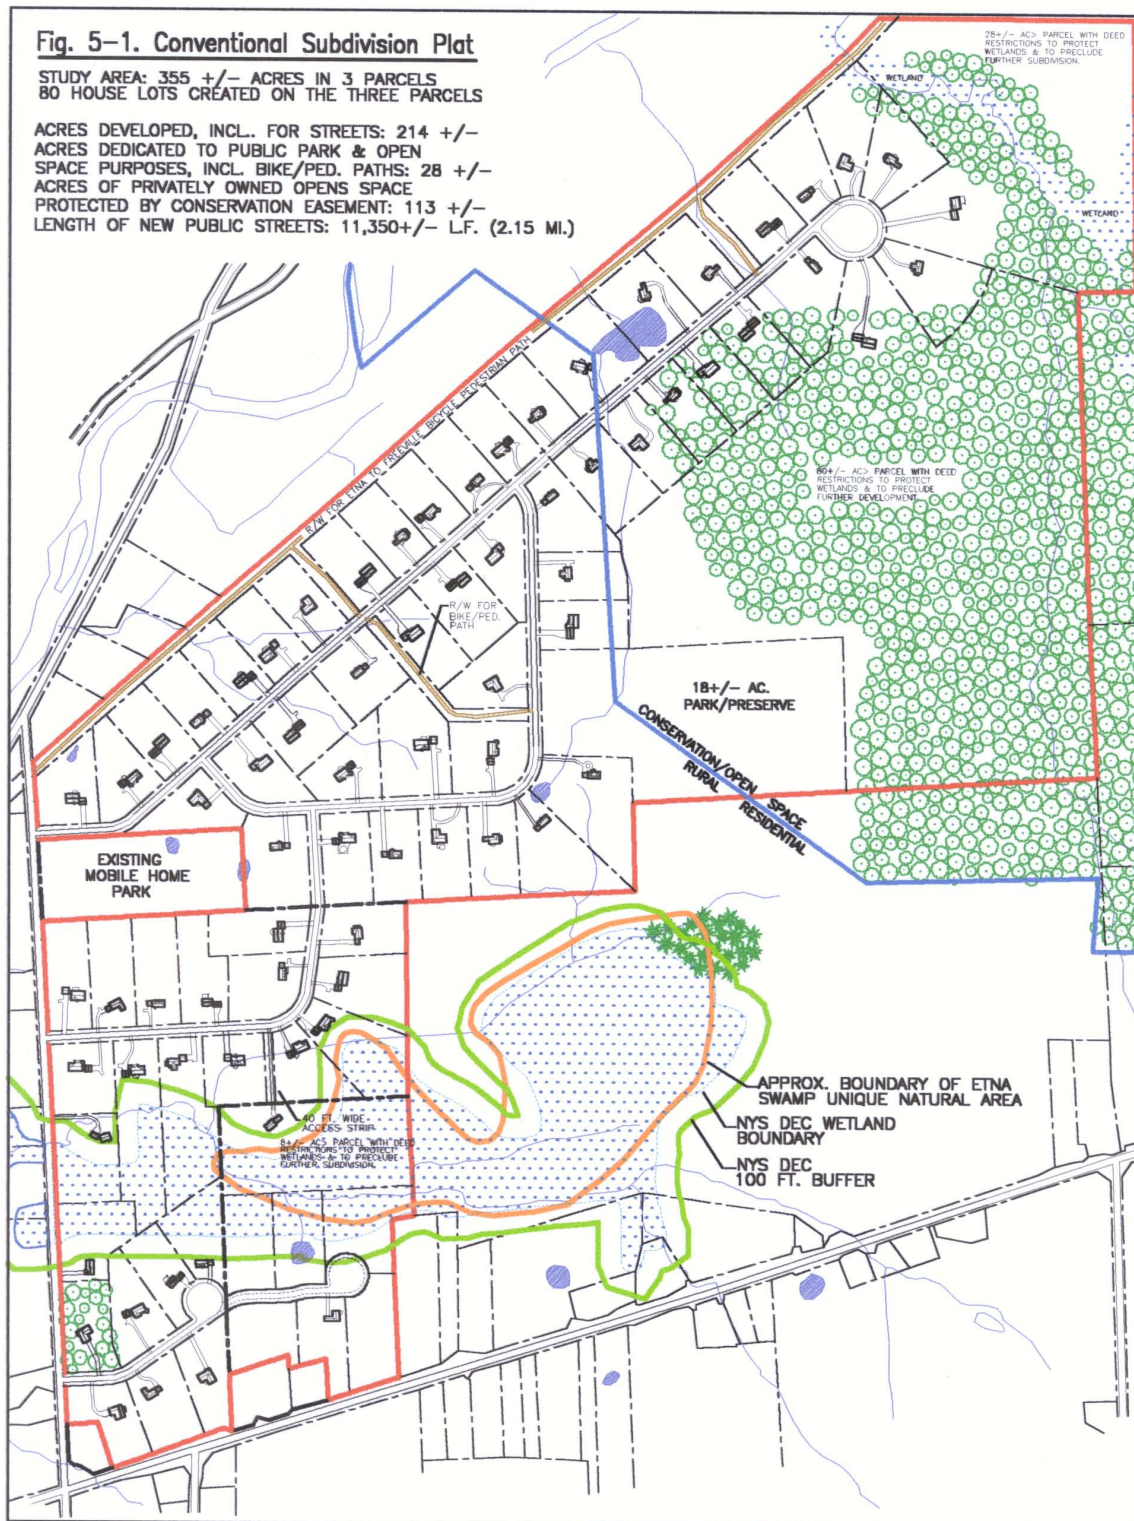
A conventional subdivision plat under proposed Rural Residential and Conservation/Open Space densities in the Etna Swamp area east of Kirk Road and north of NYS Rte. 13.
